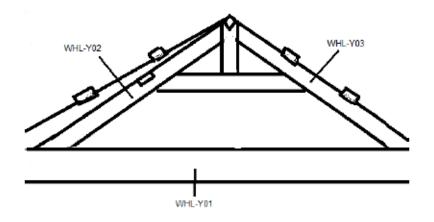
Sketch of truss 1, showing the location of samples WHL-Y01-03
